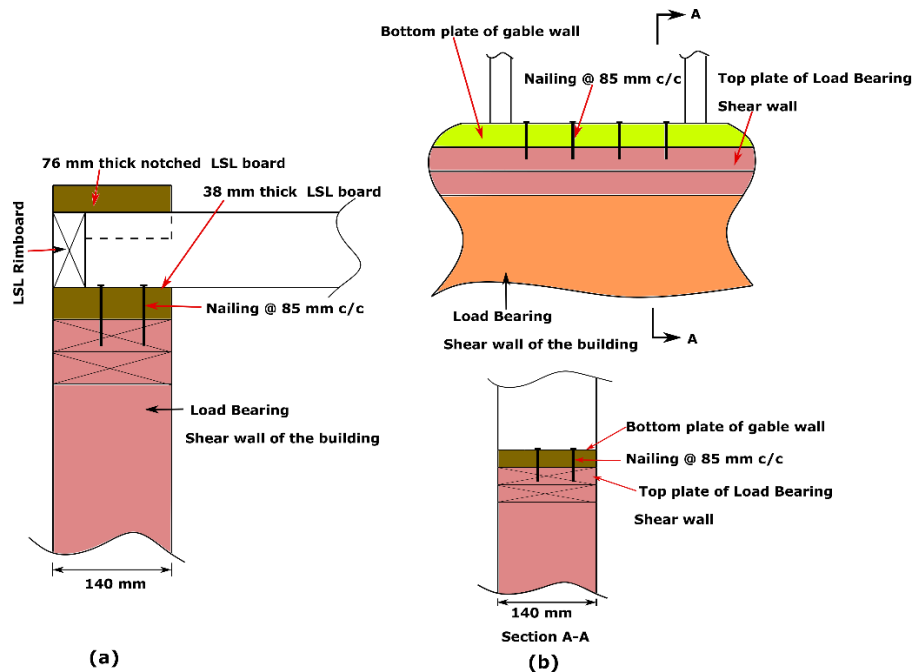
(a) Ceiling Frame-to-Load bearing Shear wall connection (b) Gable Wall-to-Load Bearing Shear wall connection.
